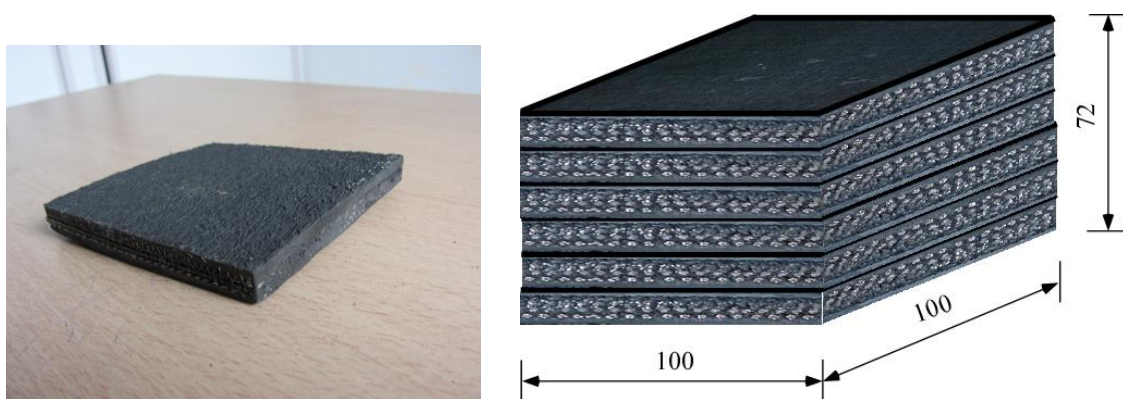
Cross section of a single layer STRP sketch and photograph
